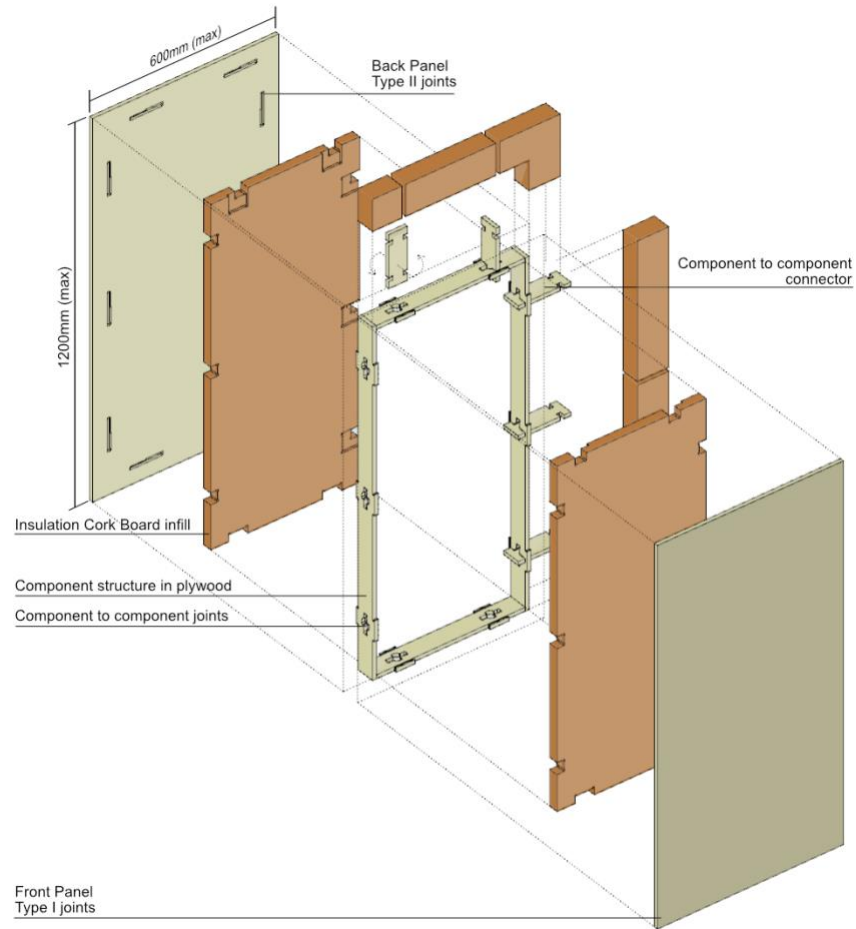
Exploded axonometric view of ORW v4 component of type A
